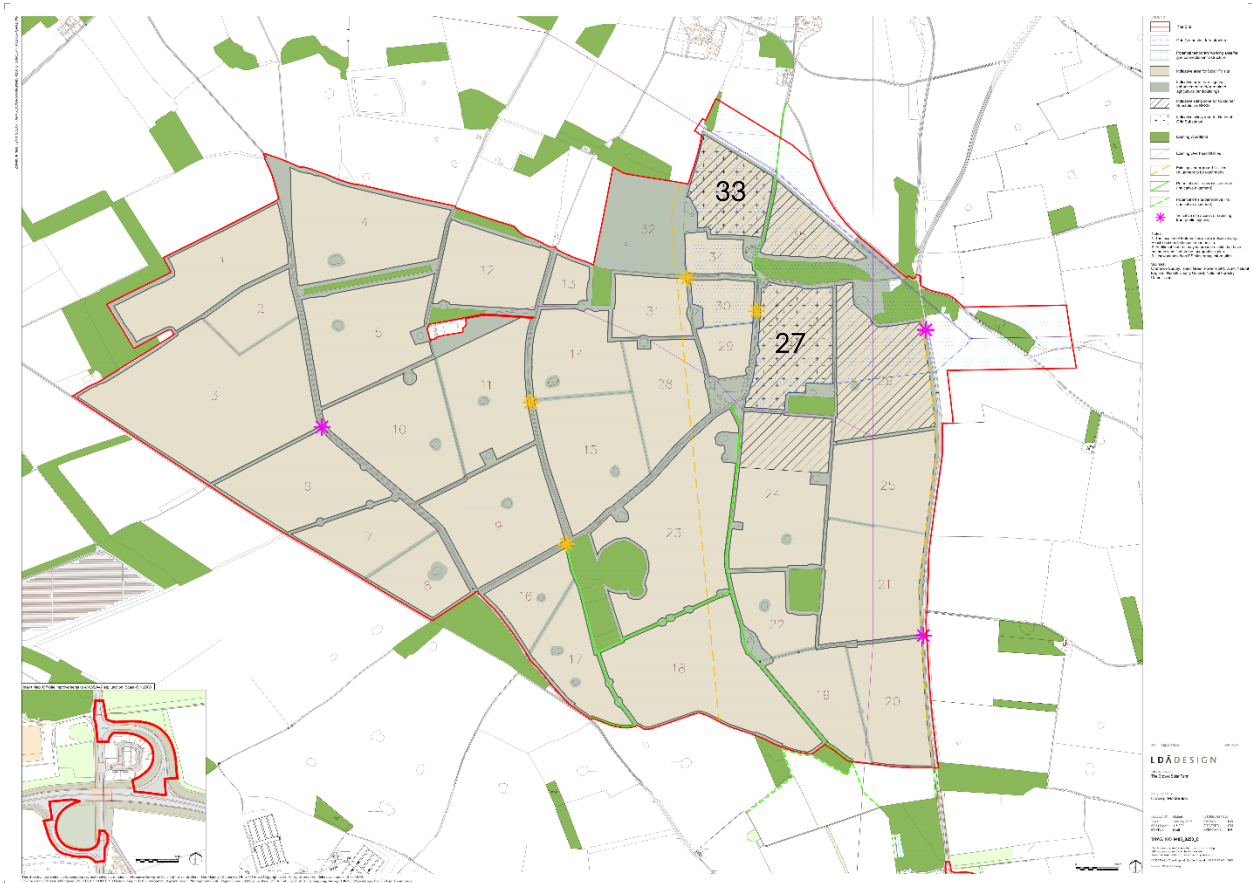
Layout of the Proposed Facility. Drawing provided by LDA Design (ref: 9485_0250_C_Concept_Masterplan.pdf).
